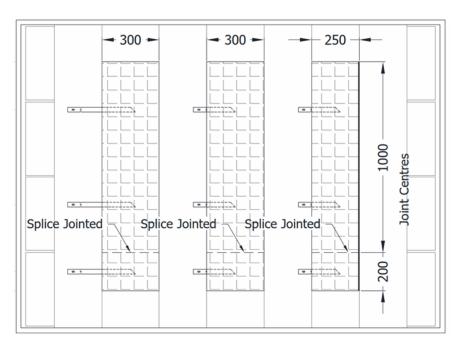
General plan view of the tested systems as provided by the report applicant.
